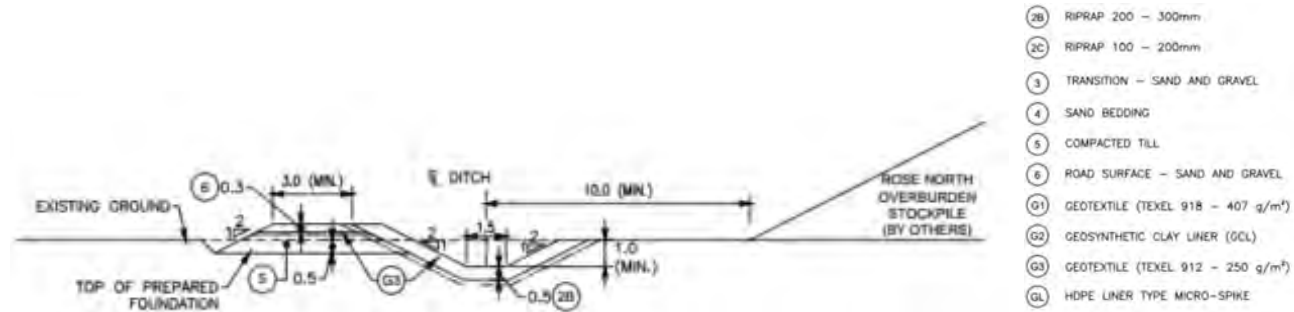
Rose North Overburden Stockpile Catchment Ditch Typical Section
